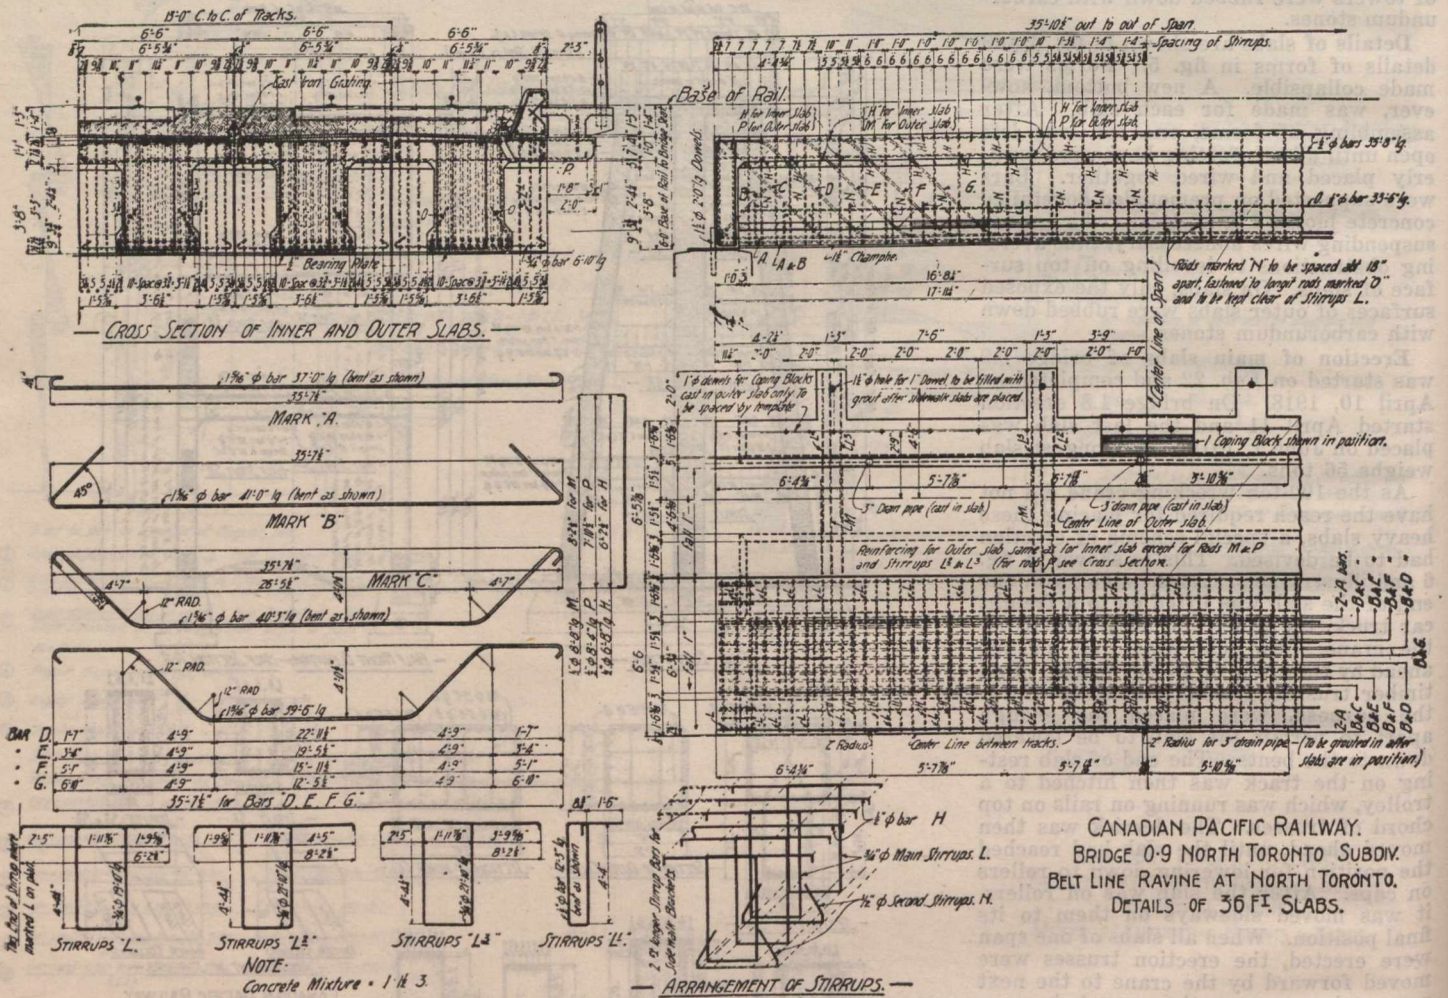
Bridge 0.9, Toronto Belt Line Ry. Ravine, North Toronto Subdivision, C.P.R. Details of 36 ft. slabs.
